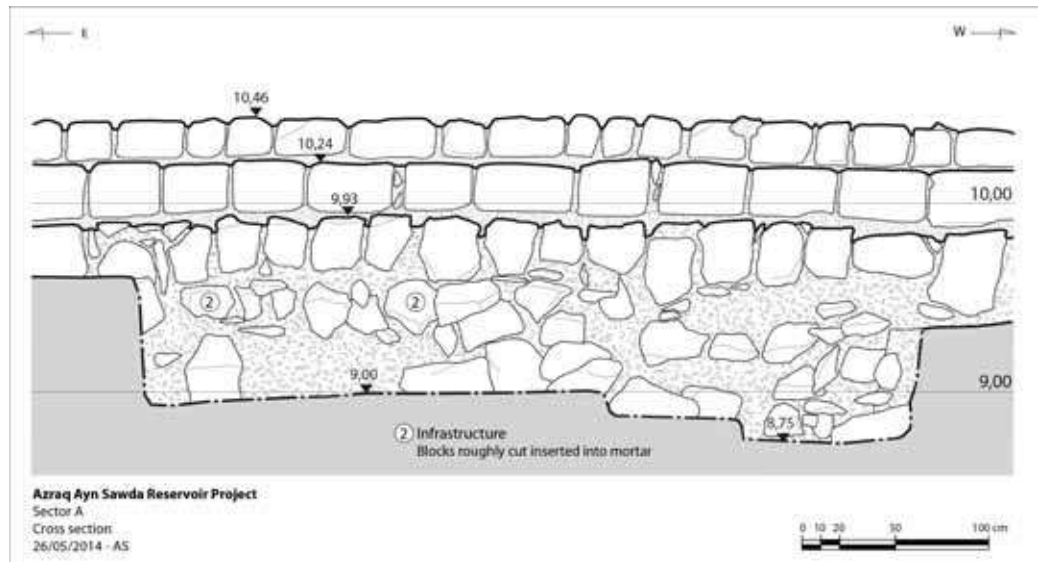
Facade of the wall M1 in sounding A north (AS 2014).
